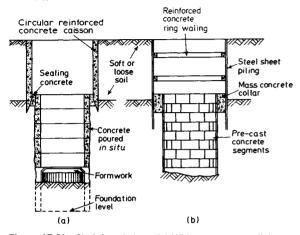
Shaft foundations. (a) With mass concrete lining constructed below caisson; (b) with precast concrete segmental lining constructed below a sheet-piled cofferdam
